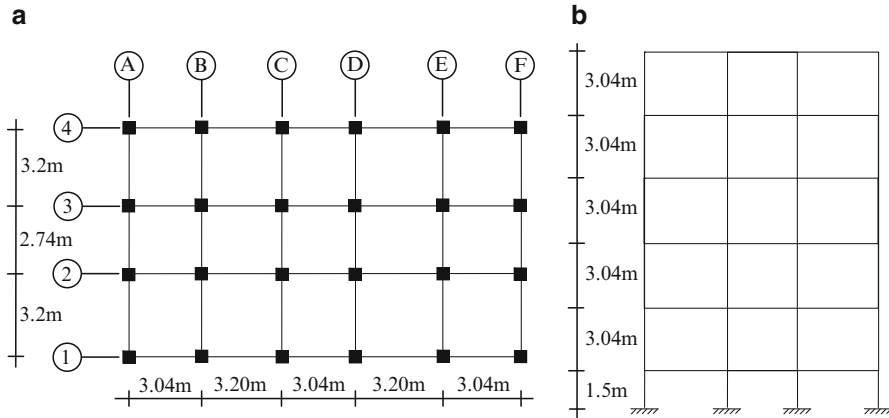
(a) Typical floor plan and (b) elevation of the building along gridline A
